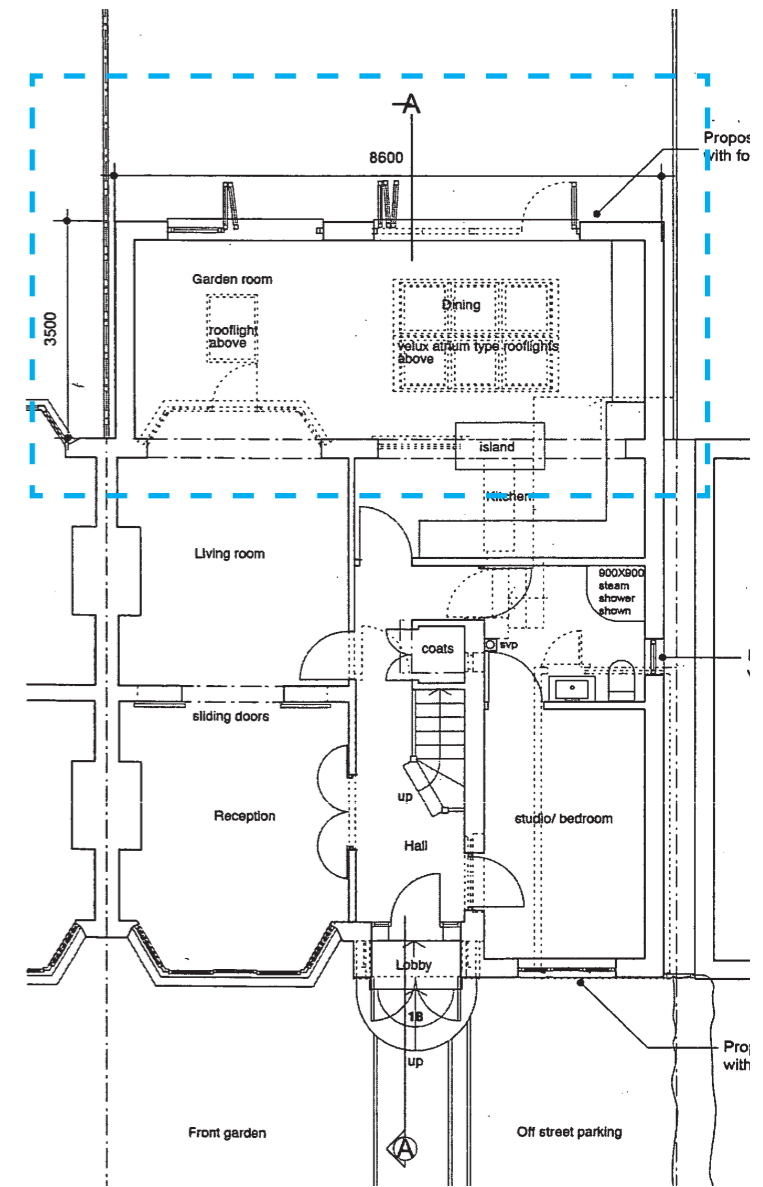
Approved first floor rear extension to no. 61 Abbots Gardens (18/6678/HSE)
